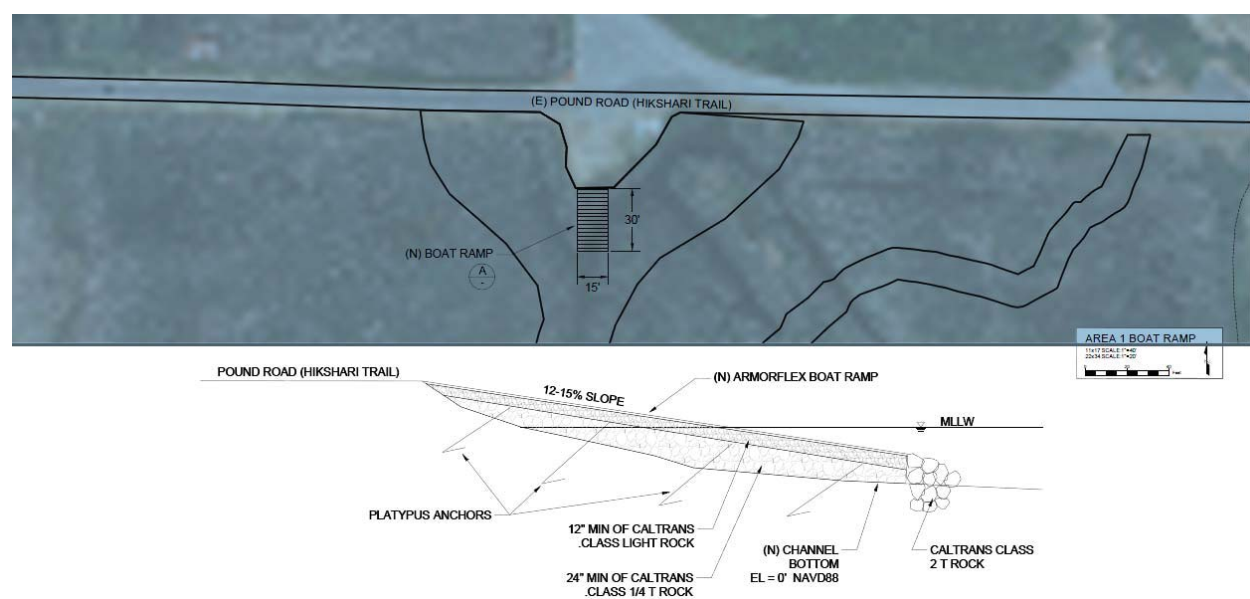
Area 1 boat ramp specifications showing location, dimensions, cross sectional view, and materials (Sheet C-16).
